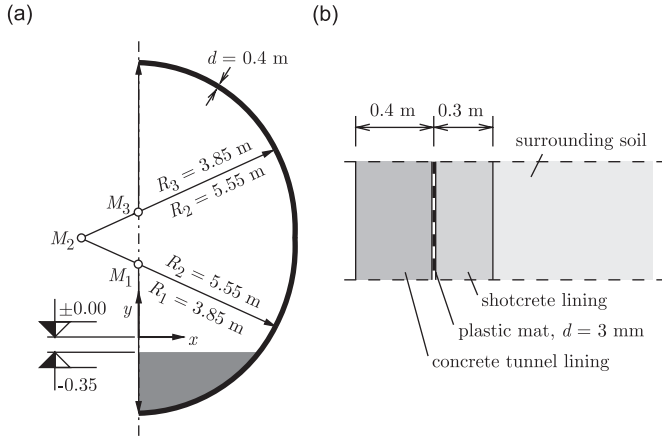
Geometric properties of the considered cross-section of the Lainzer tunnel: (a) dimensions of the tunnel and (b) cross-section of the tunnel lining.
